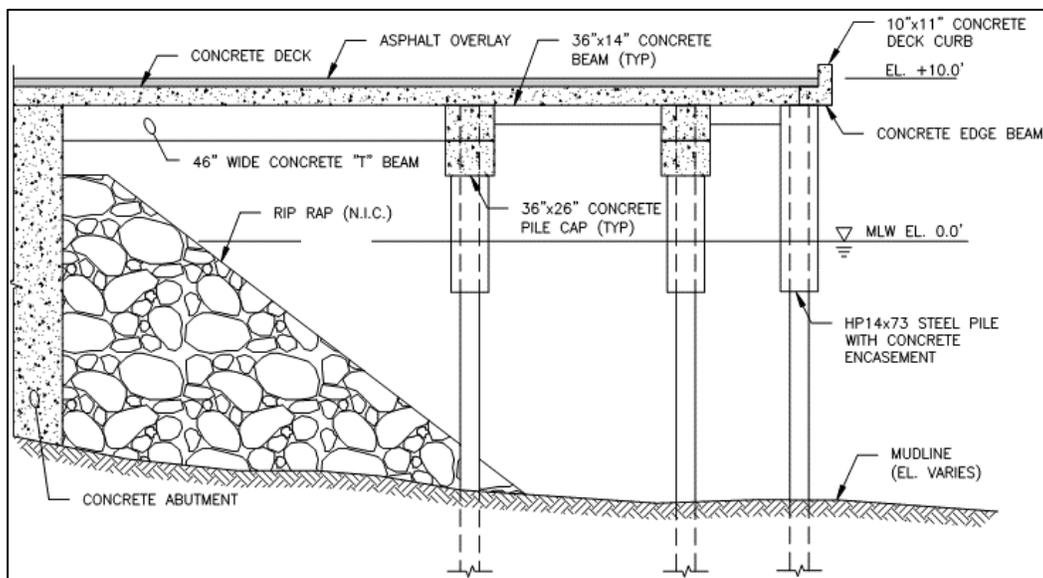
Section view of the Approach Pier structure.<sup>1</sup>
